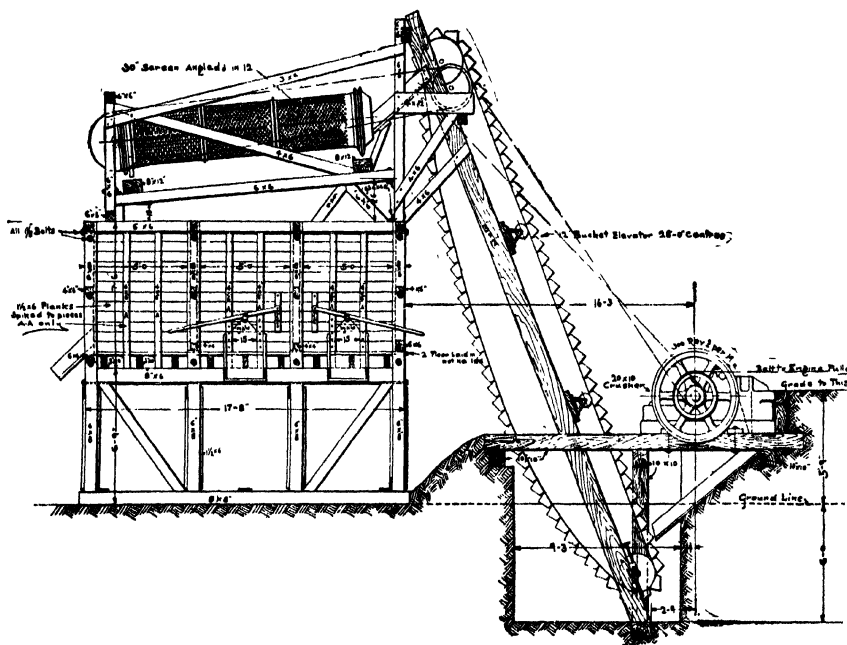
Small Crushing Plant with Elevator, Screen, and Portable Bin. (See p. 224)
